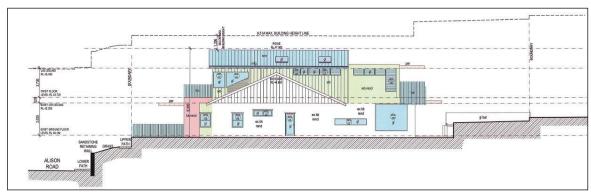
Proposed East (Side) Elevation (Urban Moose)
